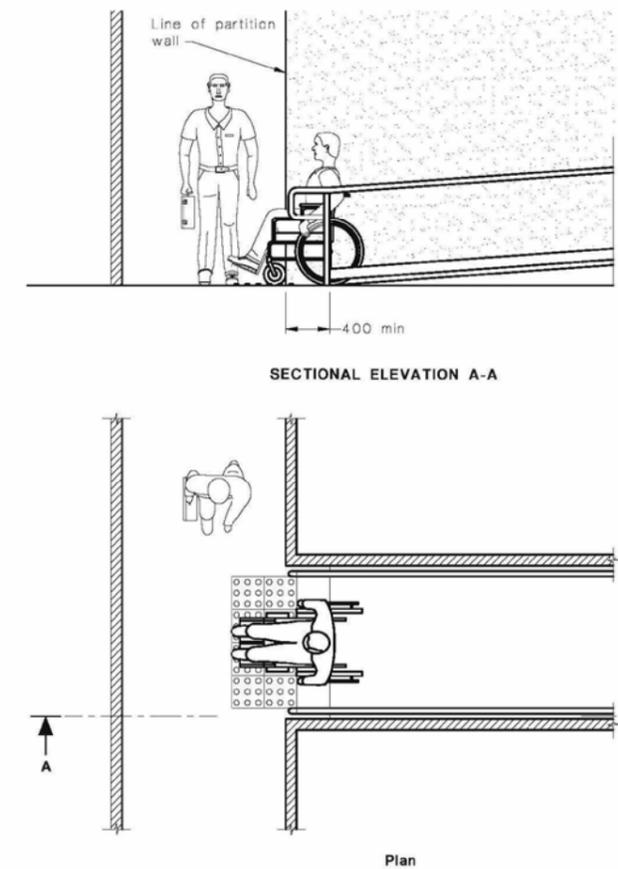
LOCATION OF RAMP TO PREVENT PROTRUSION OF HANDRAILS INTO A TRANSVERSE PATH OF TRAVEL OTHER THAN AT BOUNDARIES
